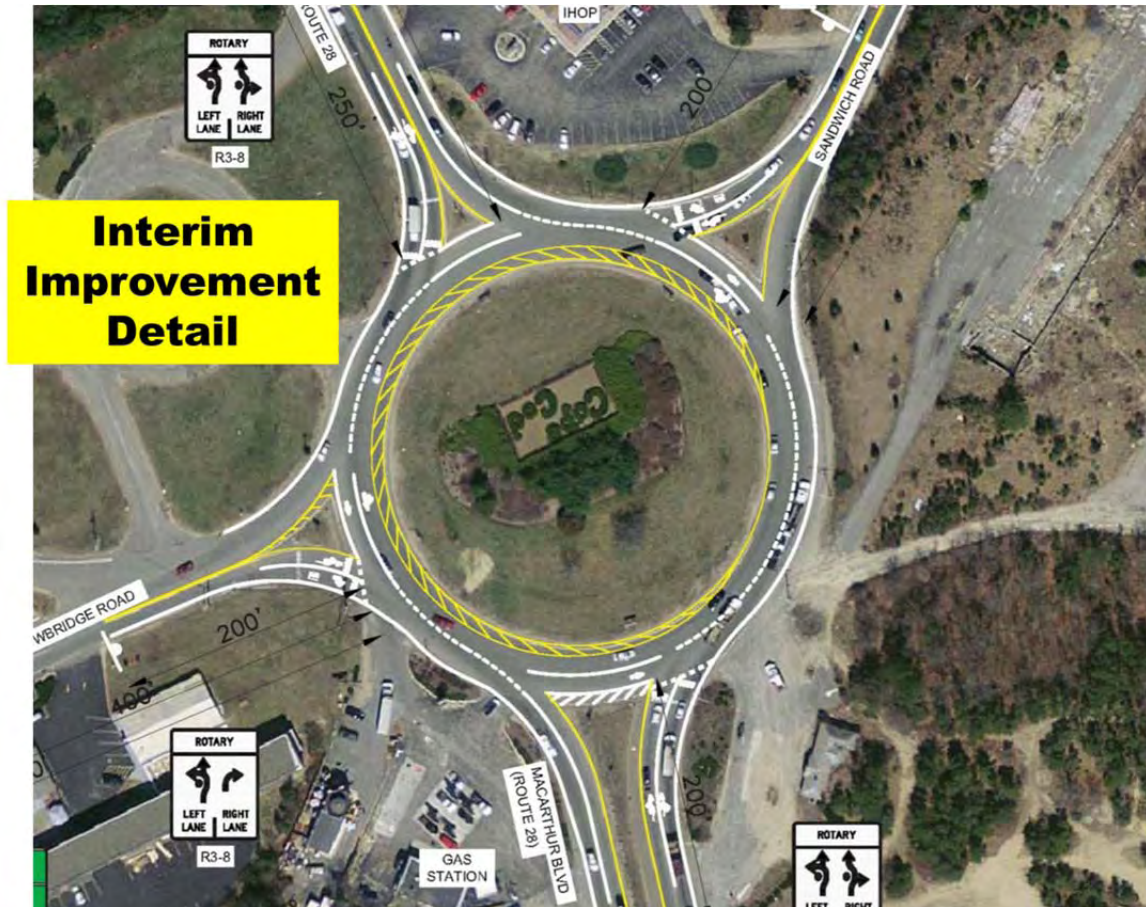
DETAIL OF PAVEMENT MARKINGS - INTERIM IMPROVEMENT
